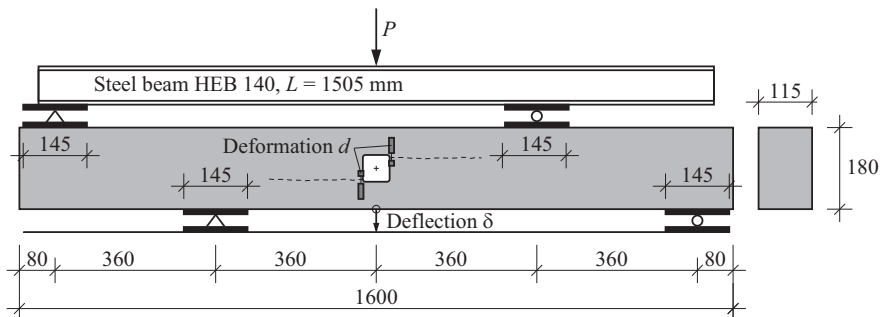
Test setups with dimensions of glulam beams and steel parts.
